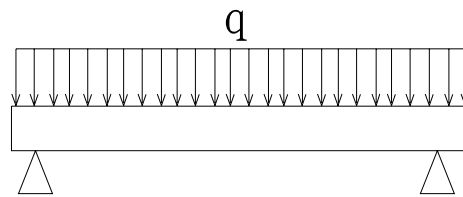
Deformation of Cement Soil Mixing Pile Wall
